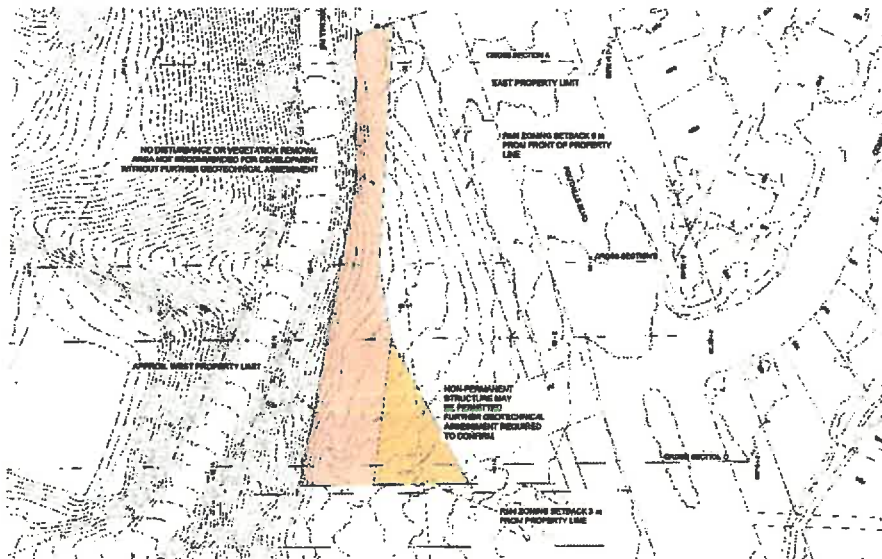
Section of McElhanney drawing no. C-01 detailing areas unsuitable for or with limited development.
